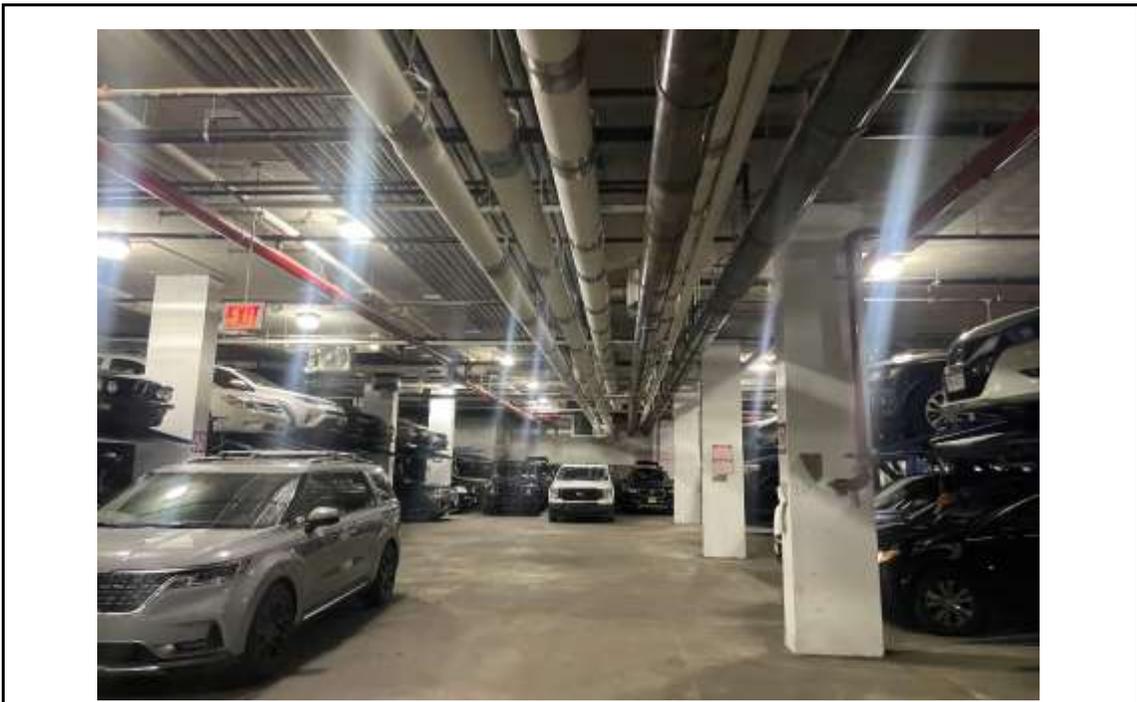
Subgrade parking garage entrance on 2nd Street, facing north. 05 December 2023.
